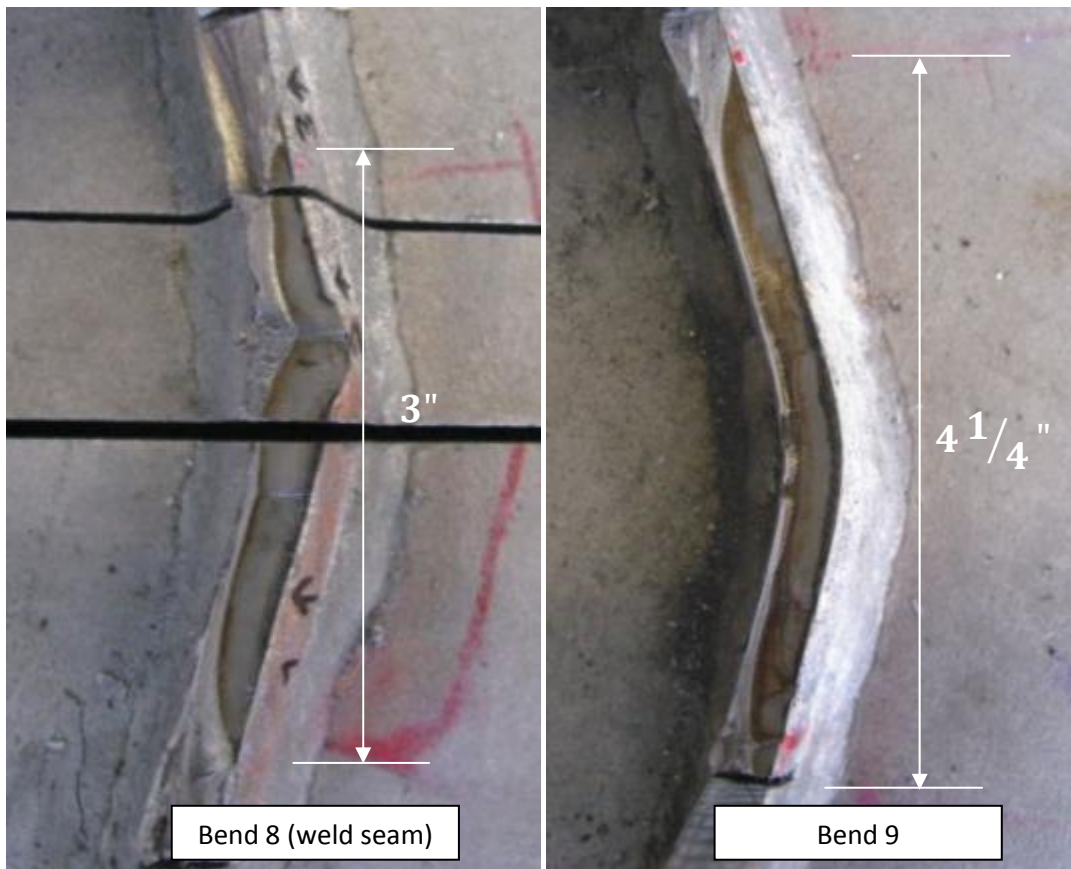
Fatigue Cracks at Bends 8 and 9
